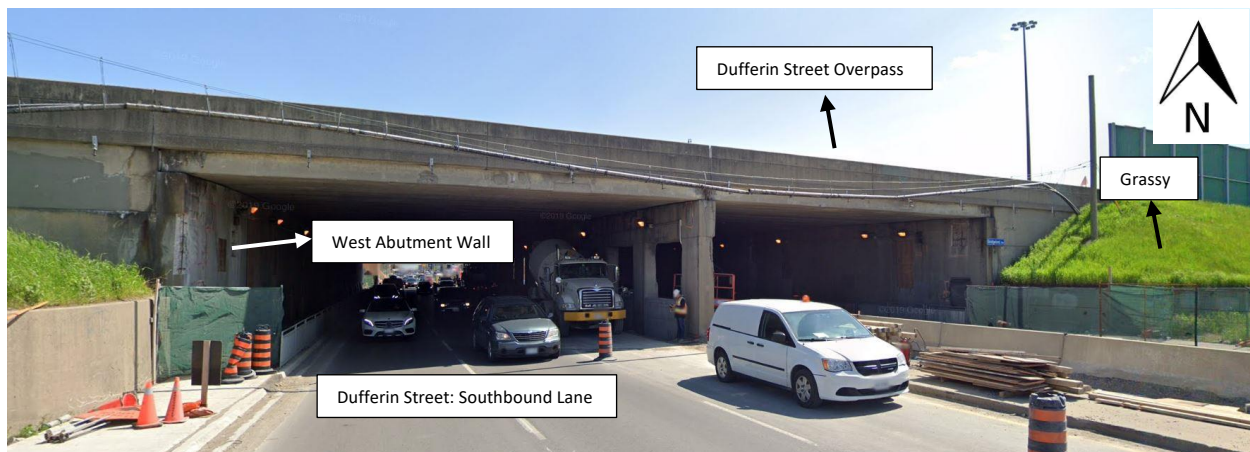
Looking towards North: Dufferin Street Overpass (November 2019)
